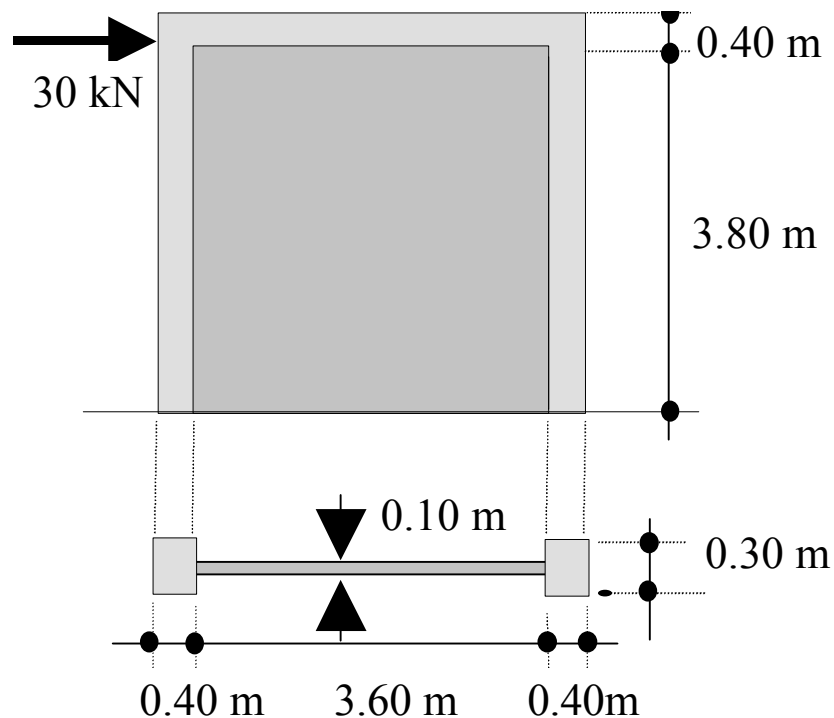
Geometry and loading of an one-story one-bay brick masonry infilled frame
